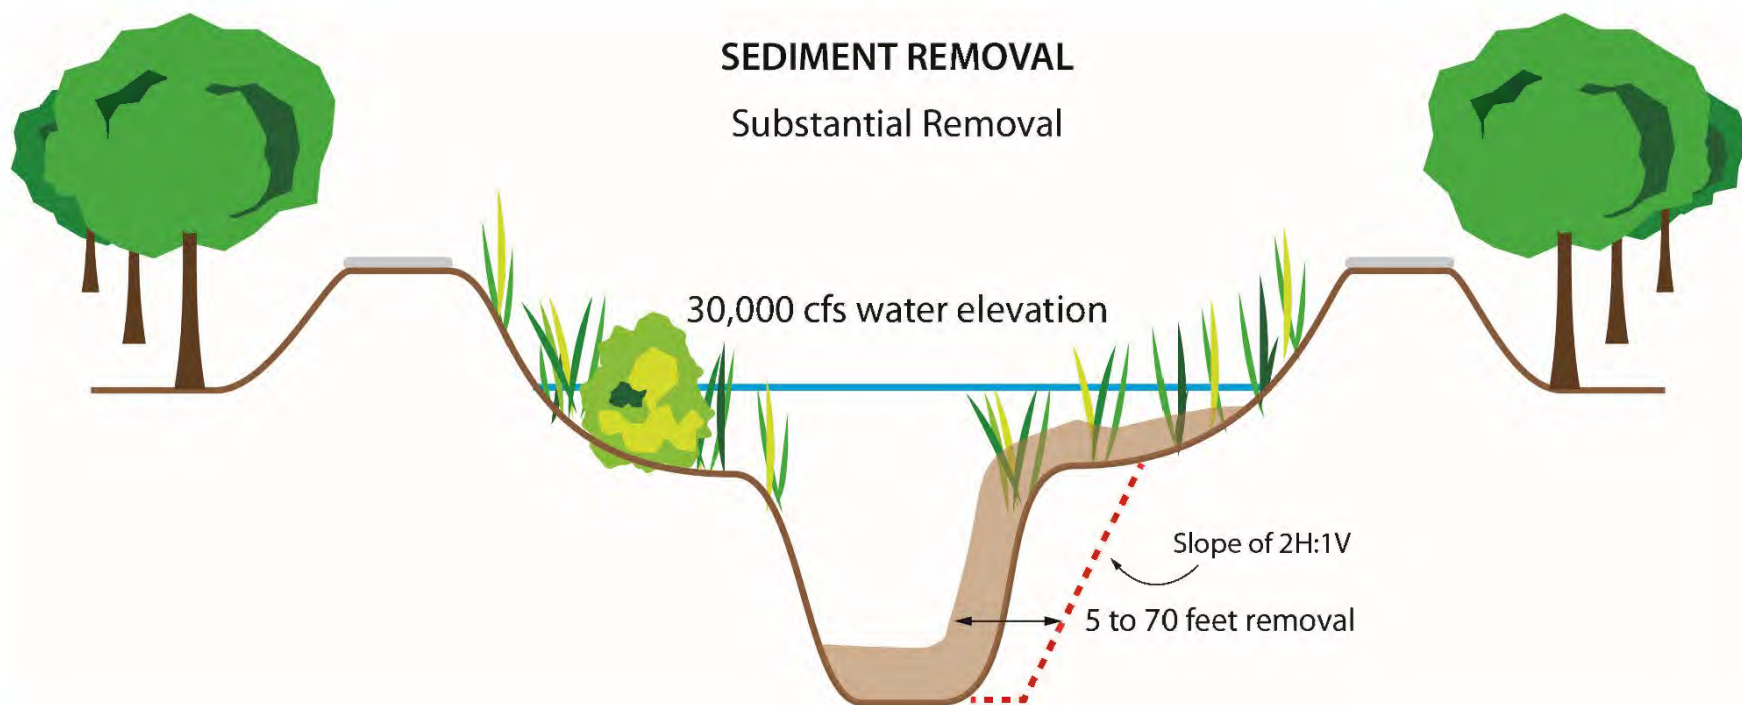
Typical Substantial Sediment Removal Cross-section
